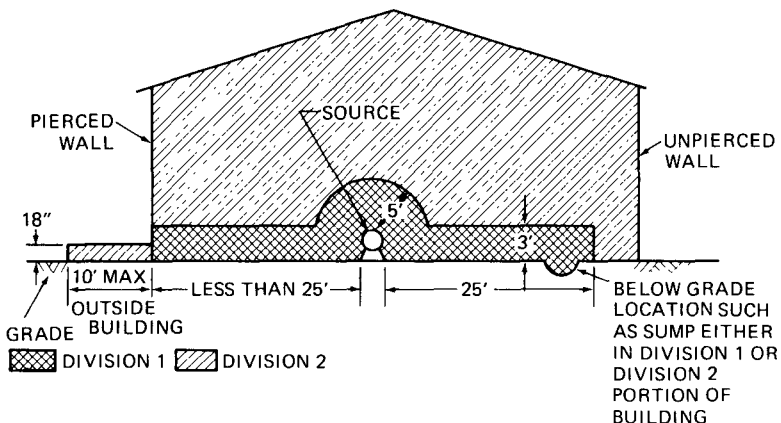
(d). Pumps and similar devices handling flammable liquids at moderate pressures, indoors with inadequate ventilation and with a pierced wall or full wall opening.
